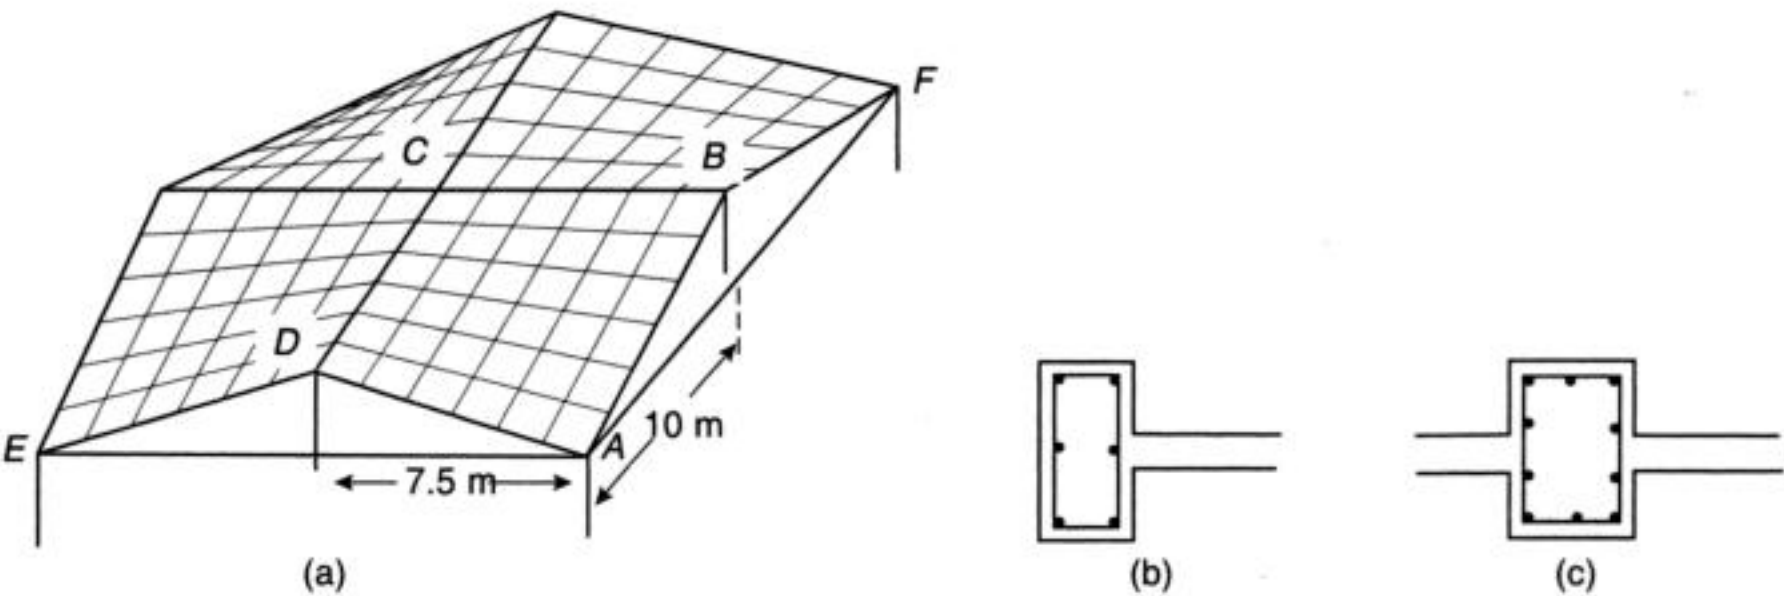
Details of a hipped hypar shell: (a) Layout, (b) Edge members, and (c) Ridge member. (See also Figure 11.6.)
